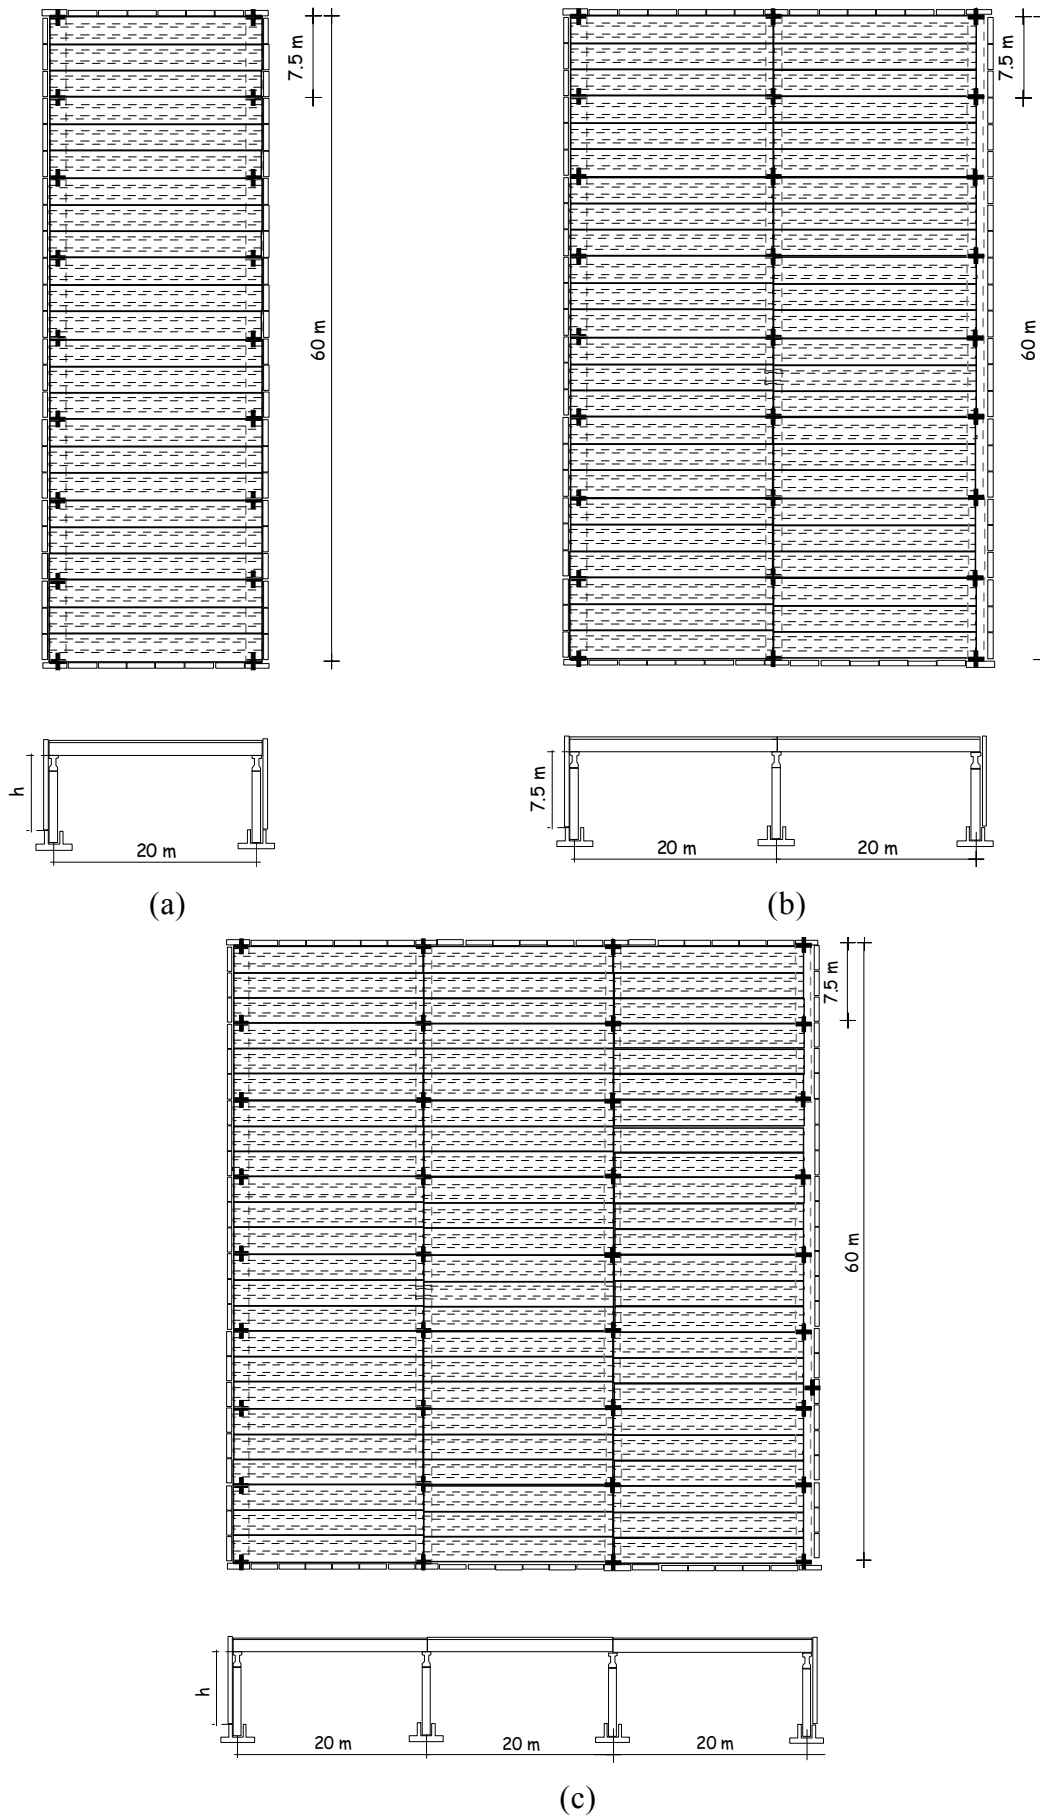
Building plan shapes considered: (a) 3/1, (b) 3/2, (c) 3/3
